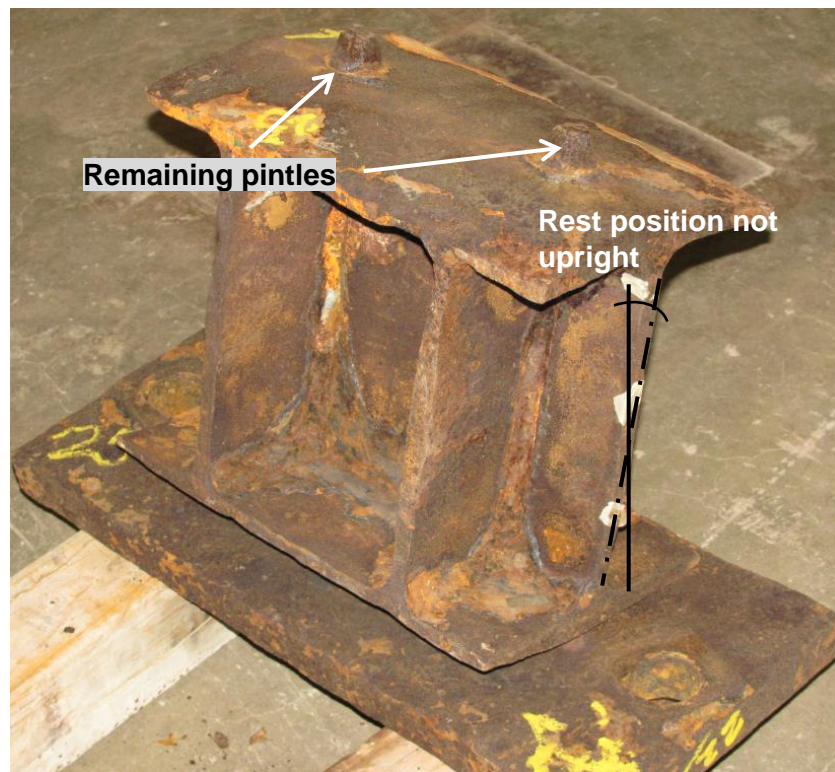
Bearing AR25 with rust removed after the initial monotonic tests
